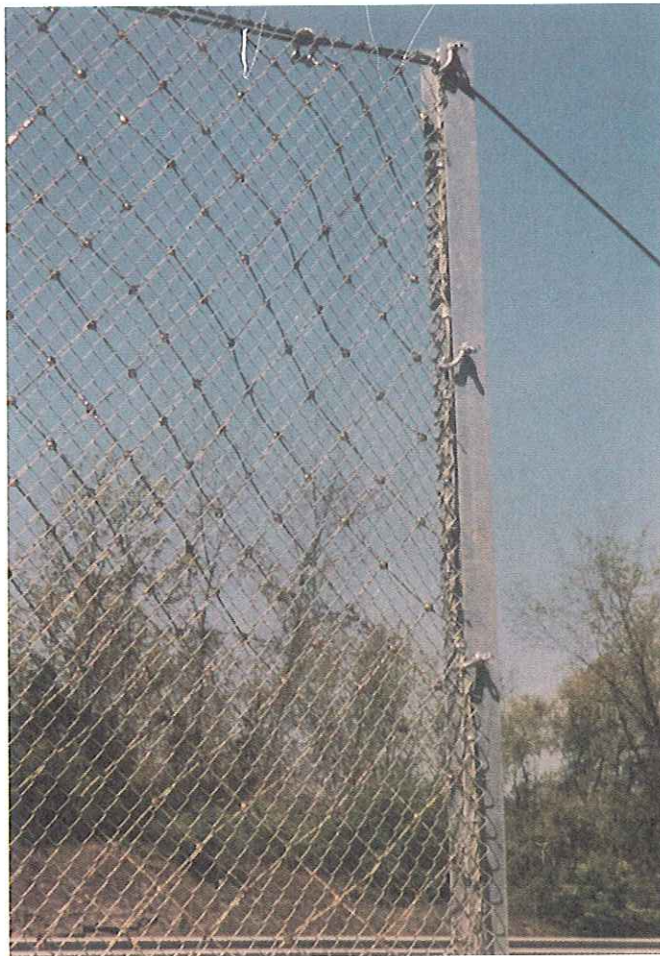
Wire mesh catch fence showing steel column, mesh, clasps, and connections. This fence was developed as a construction fence (Courtesy New York Thruway Authority).
